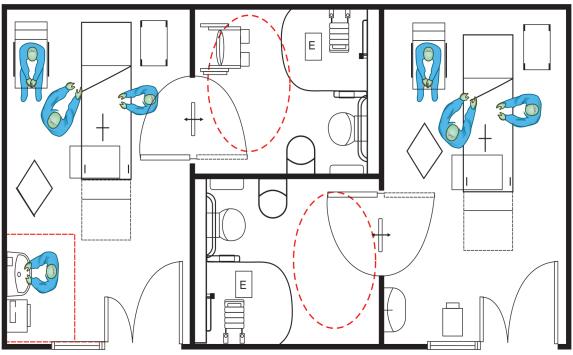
Upgrading existing rooms into isolation room with anteroom (adapted from NHS estates health building note)⁹ instead of existing bedrooms
